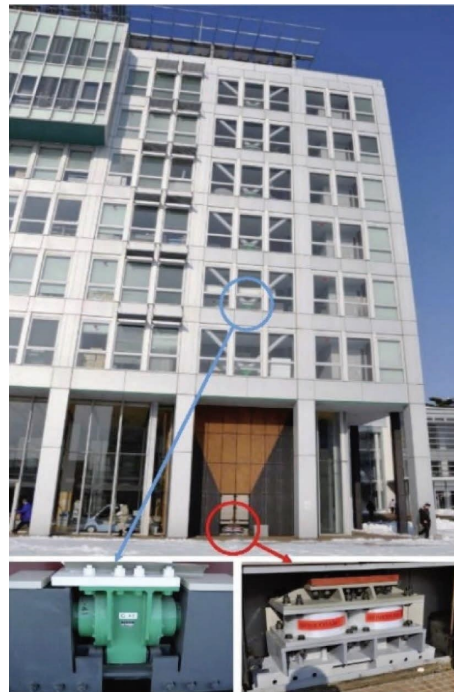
Retrofitted building with isolators on the 1st floor and oil dampers on the 3rd~8th floors.
